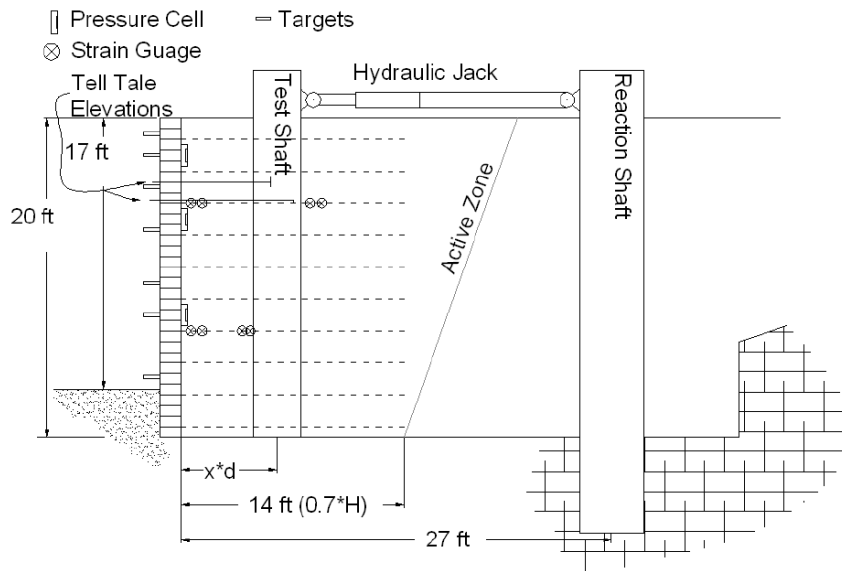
Elevation view of shaft and instrumentation locations (Pierson et al. 2009).
